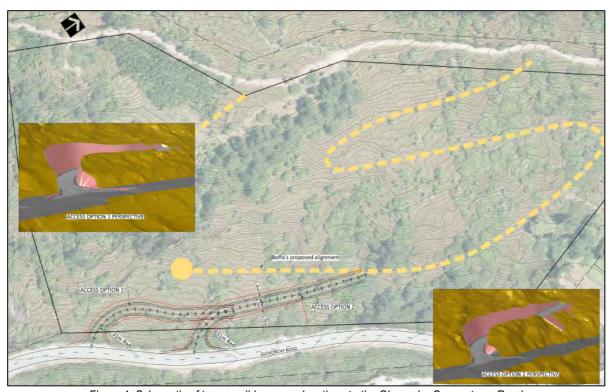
Schematic of two possible access locations to the Glenorchy-Queenstown Road.
